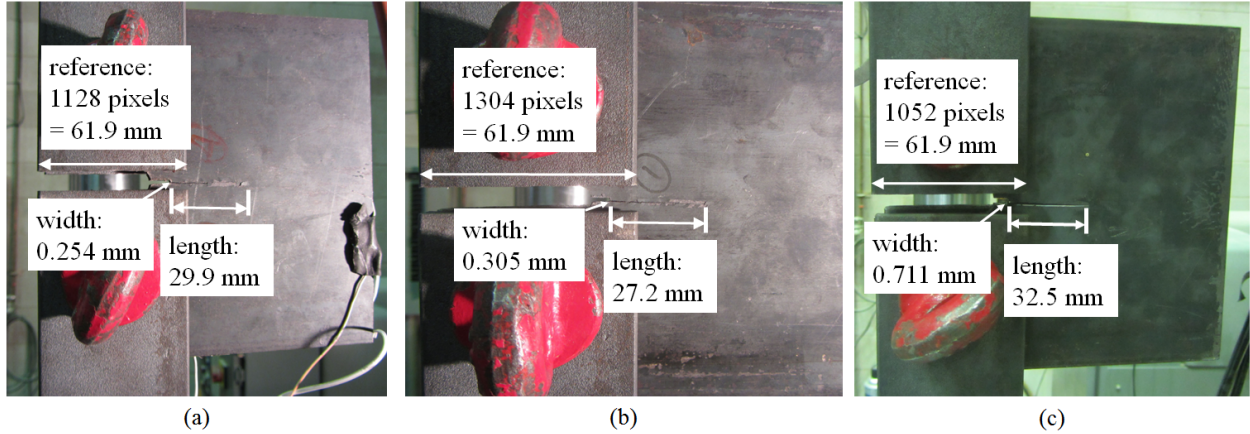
Pictures of cracked specimens at the plateau: (a) test 1; (b) test 2; and (c) test 3.
